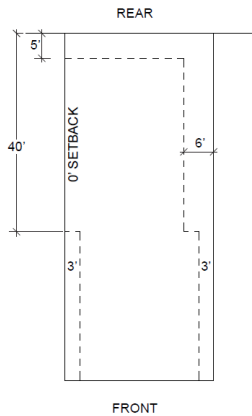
A.5: Variable Side Setbacks - Urban Home Dwelling
